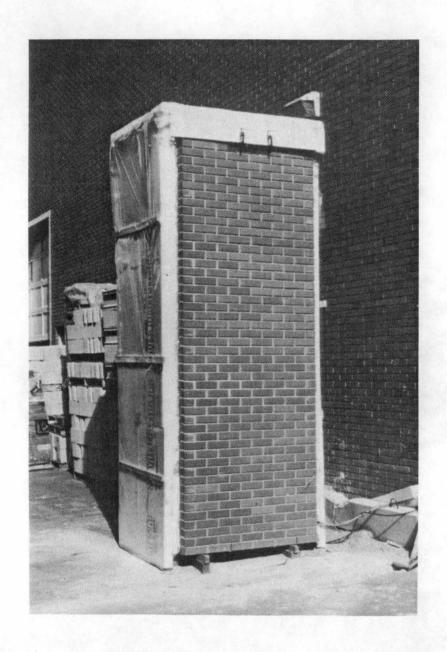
Cavity Wall Exposed to Climatic Conditions
